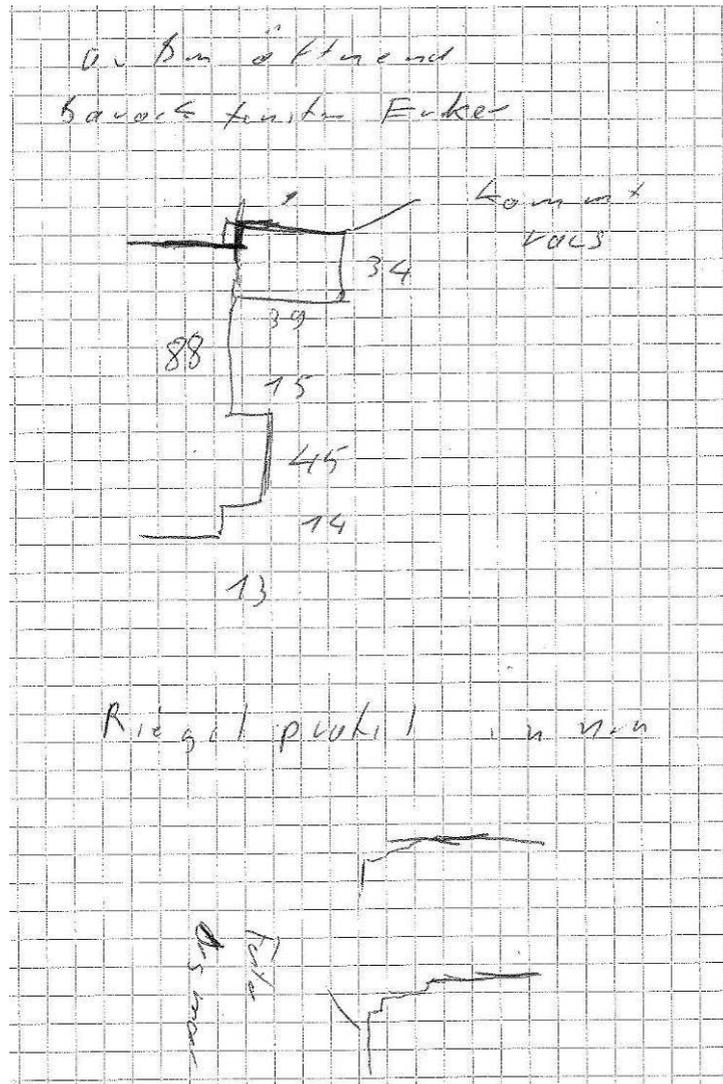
Dimensions of the bay window: window frame, exterior reveals and wooden frame on the outer side for fixing the window shutters
